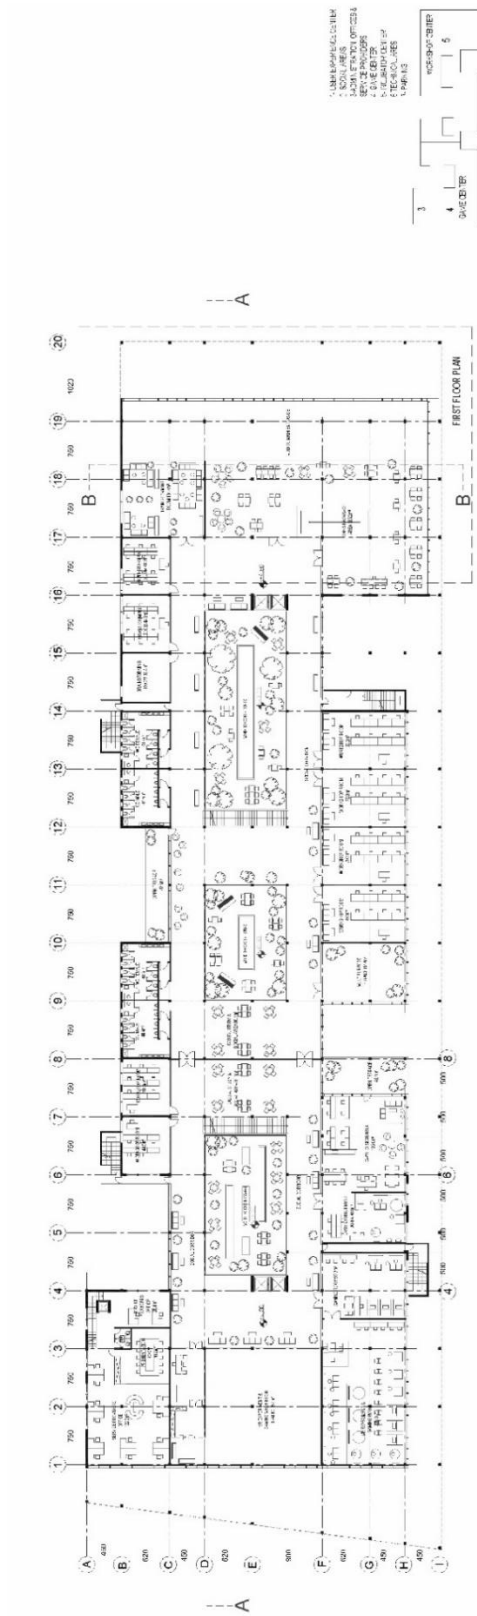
First floor plan of Antalya Technology and Innovation Center.
